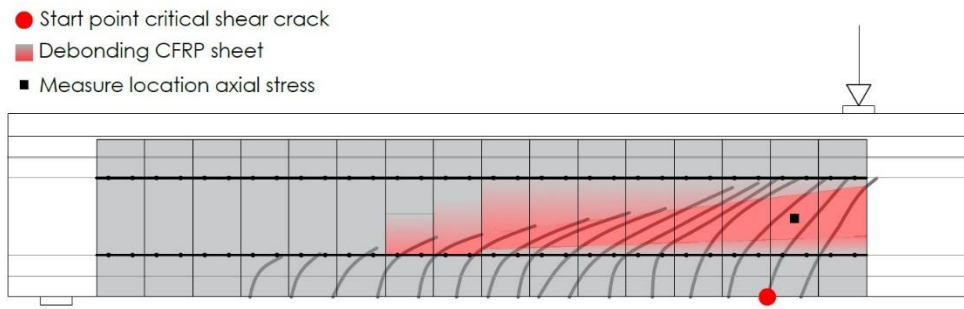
Crack pattern and CFRP debonding specimen I-VA-S0-SP5 at load step 199
